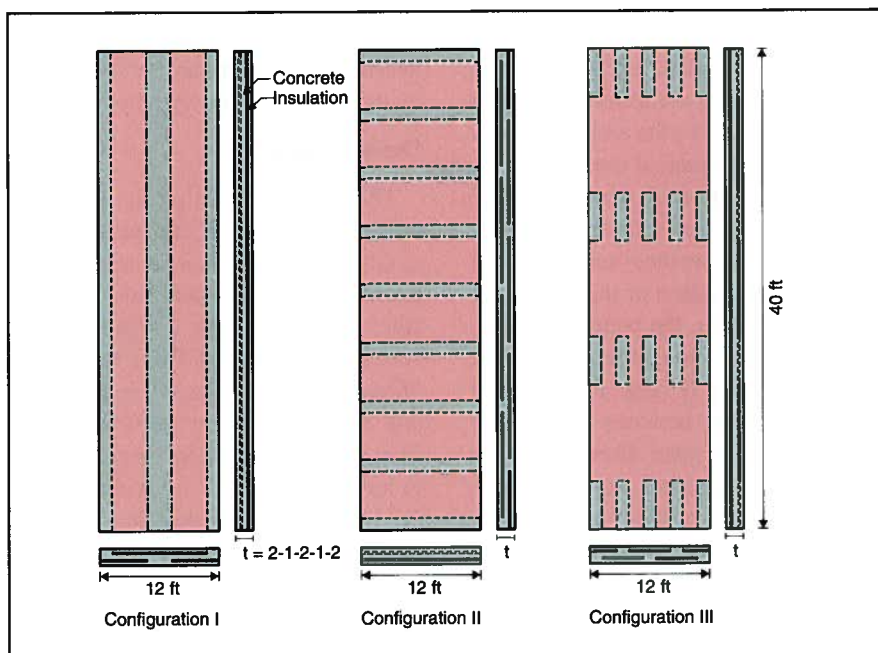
Precast concrete three-wythe sandwich wall panel configurations. Note: 1 ft = 0.3048 m.
